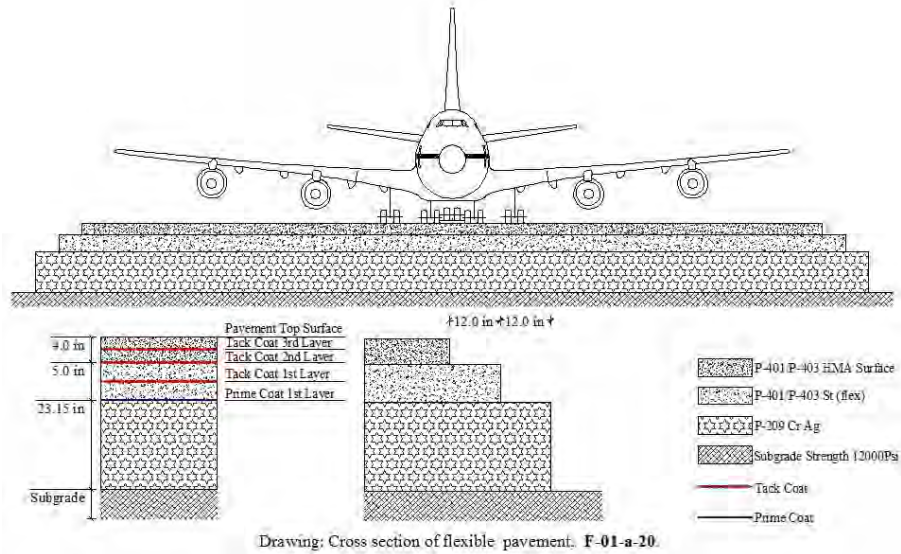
Flexible pavement (F-01-a-20) cross sectional drawing.
